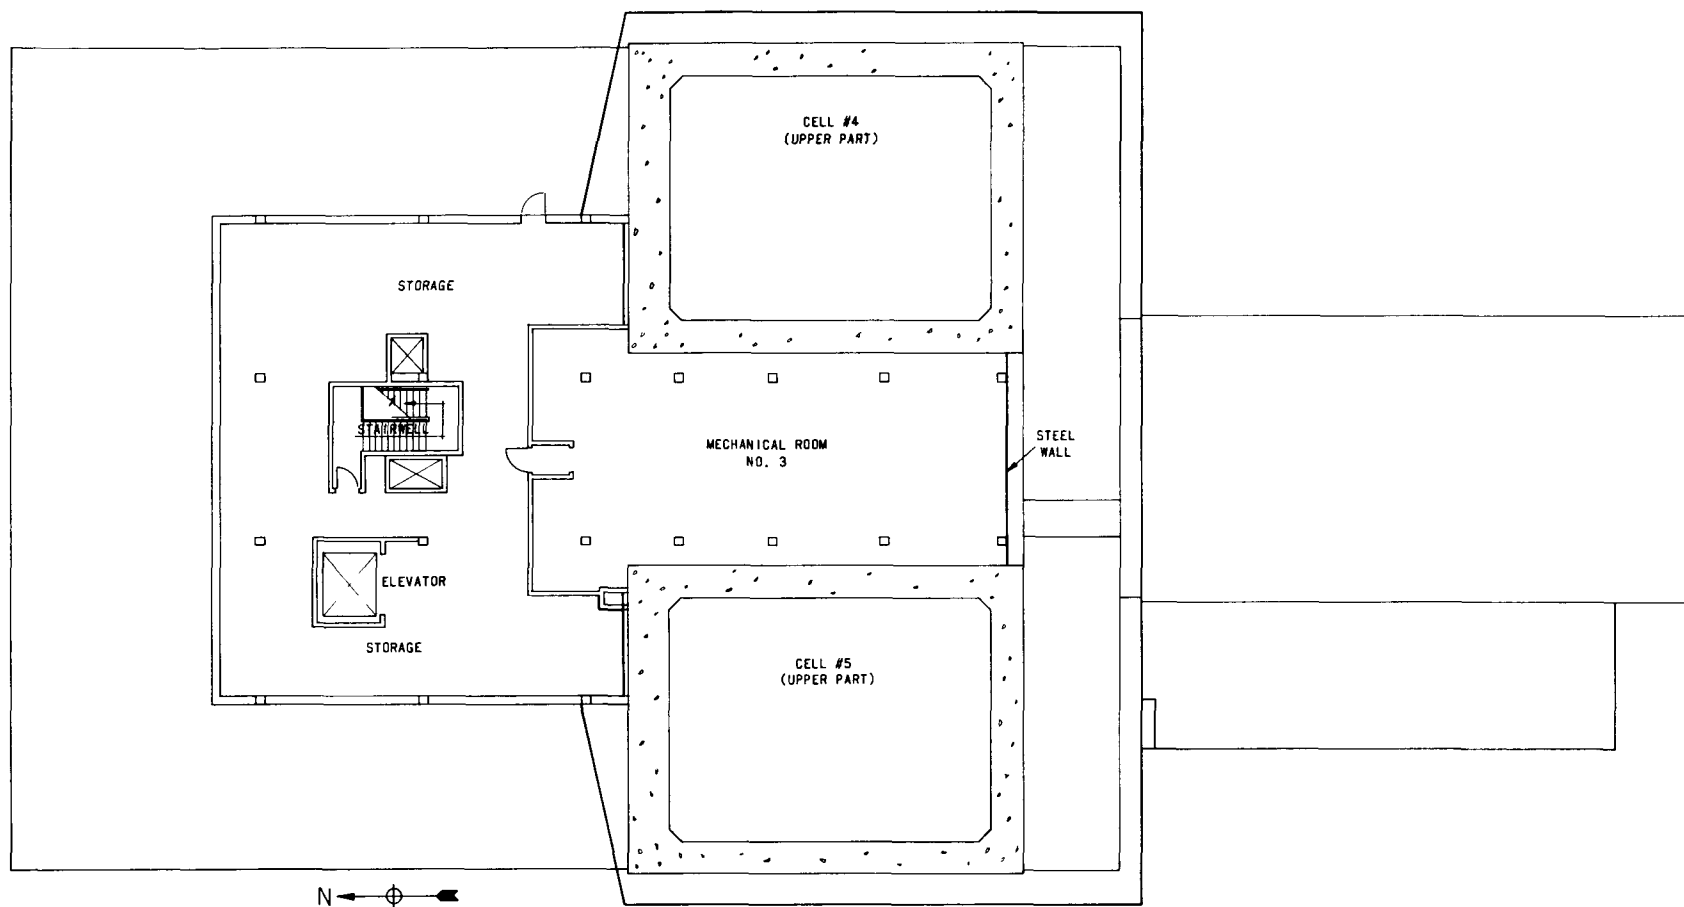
Penthouse Floor Plan, Bldg. 316-W
